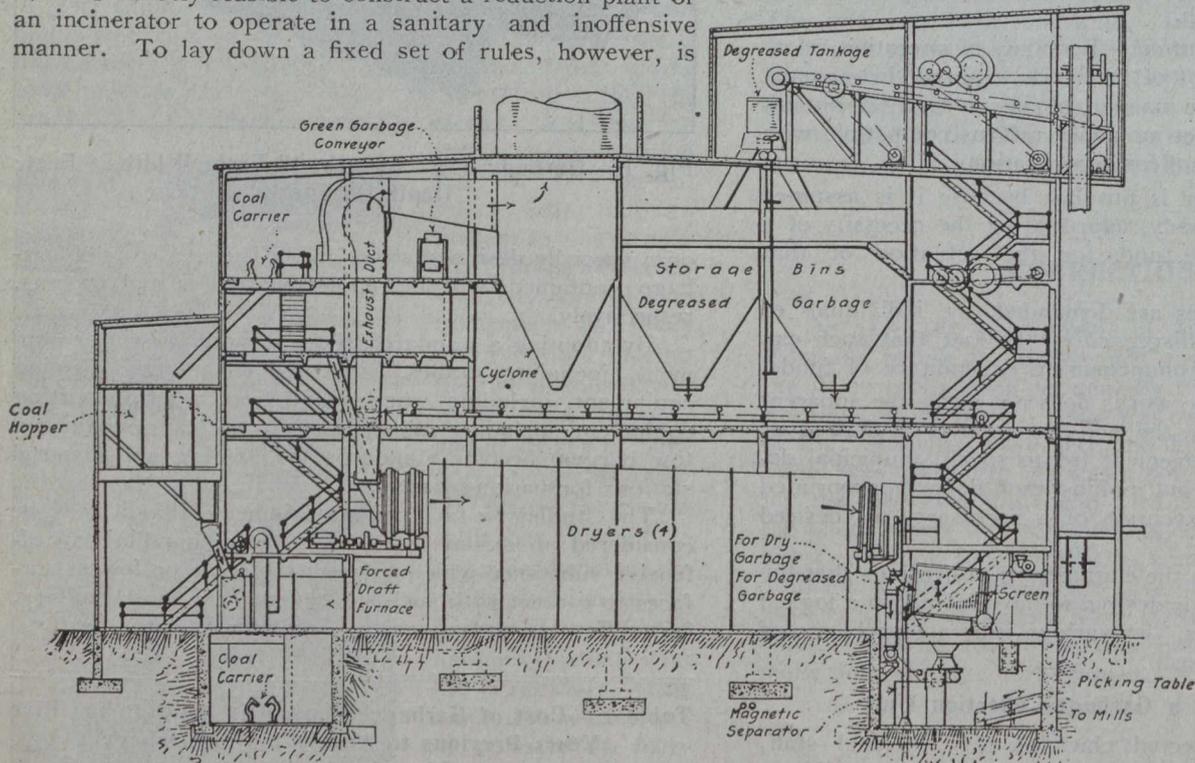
Longitudinal Section of Dryer Building, Chicago Municipal Reduction Plant
